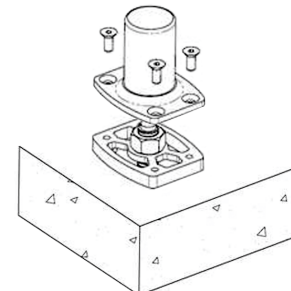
Figure D. Attach Rail Mounting Base with four (4) 5/16" x 3/4" machine screws.
